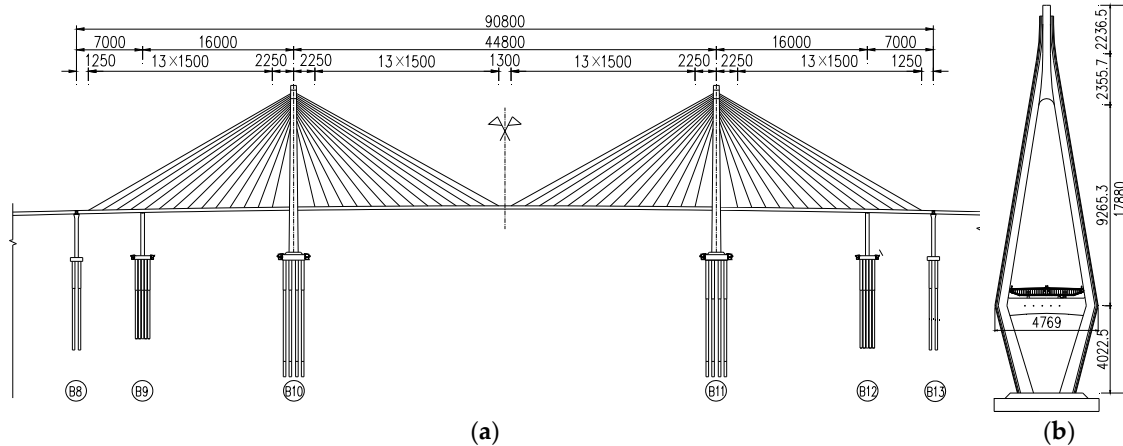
Layout of the Hangzhou Bay Bridge (Unit: cm). (a) Span arrangement of girder, (b) Pylon.
